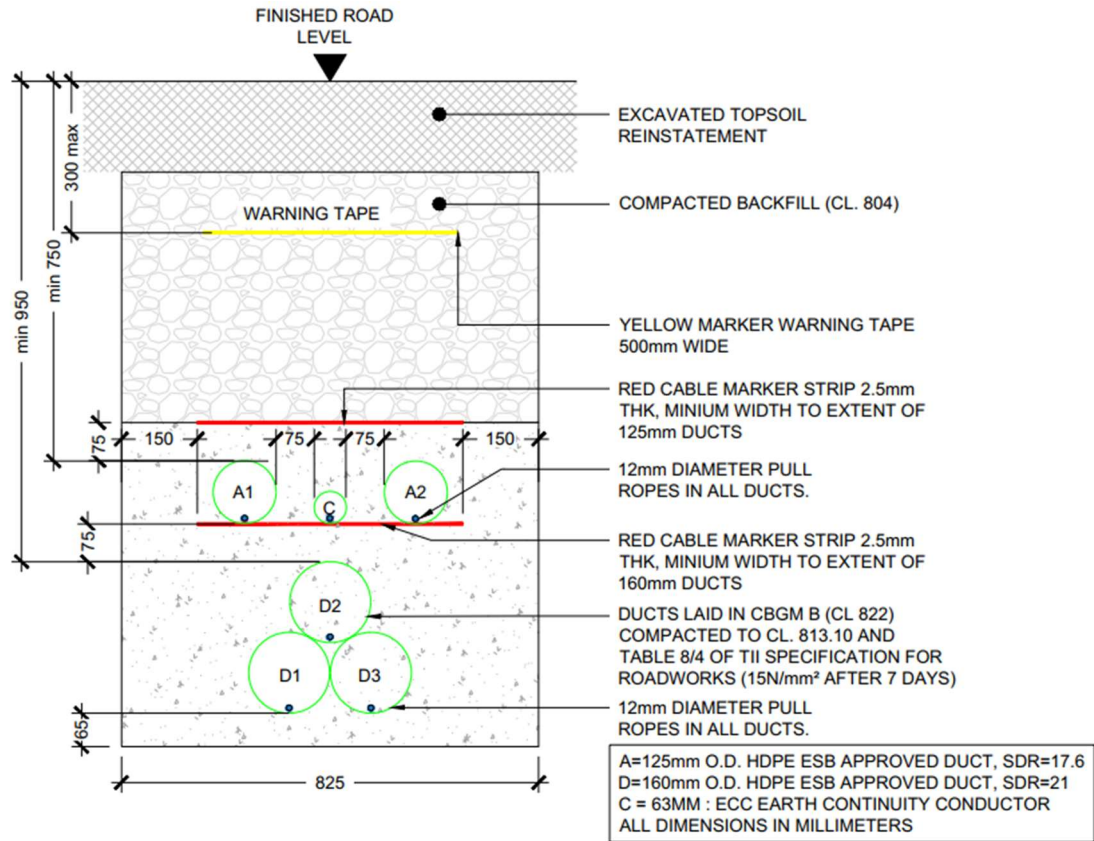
Typical Cable Trench Layout in Soft Landscaped Area
